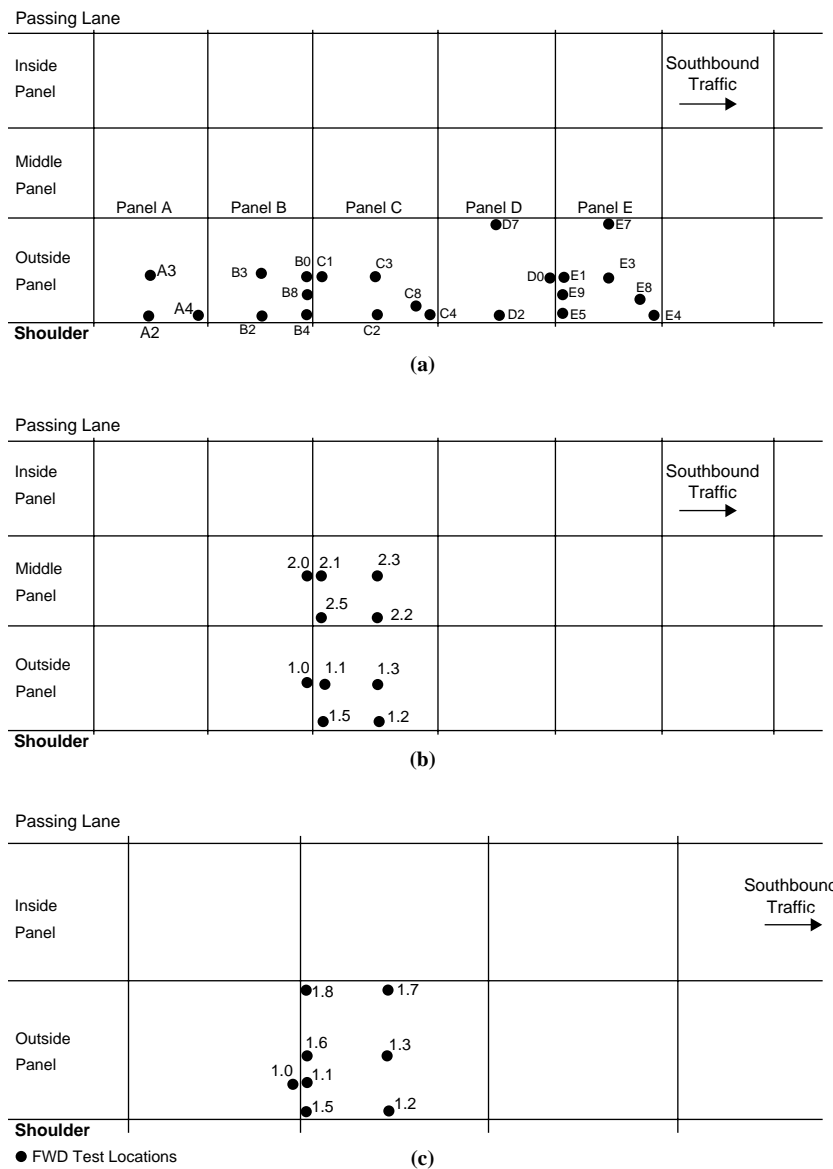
US-169 UTW FWD test locations at the (a) Jackson Street intersection with 3-in.-thick UTW with 4- × 4-ft panels; (b) School Street intersection with 3-in.-thick UTW with 4- × 4-ft panels; and (c) Main Street intersection with 3-in.-thick UTW with 6- × 6-ft panels.
